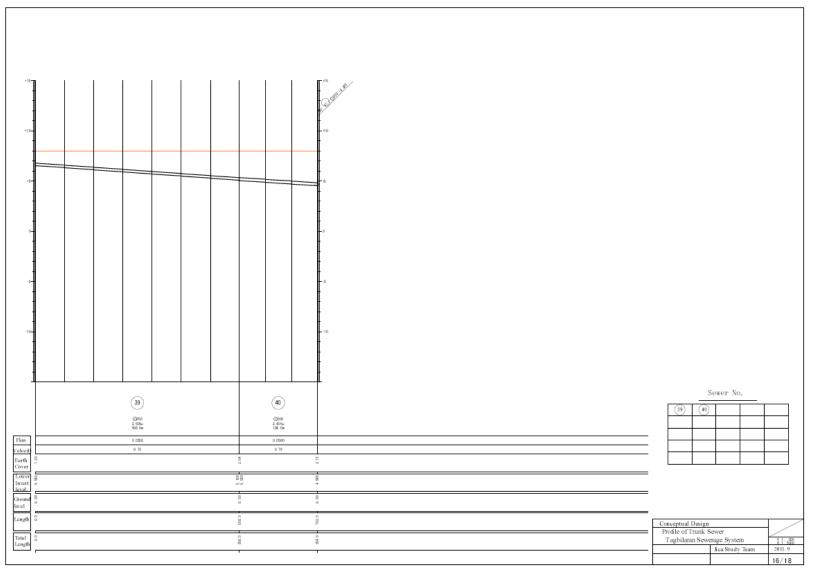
Profile of Trunk Sewer (Tagbilaran Sewerage System)
